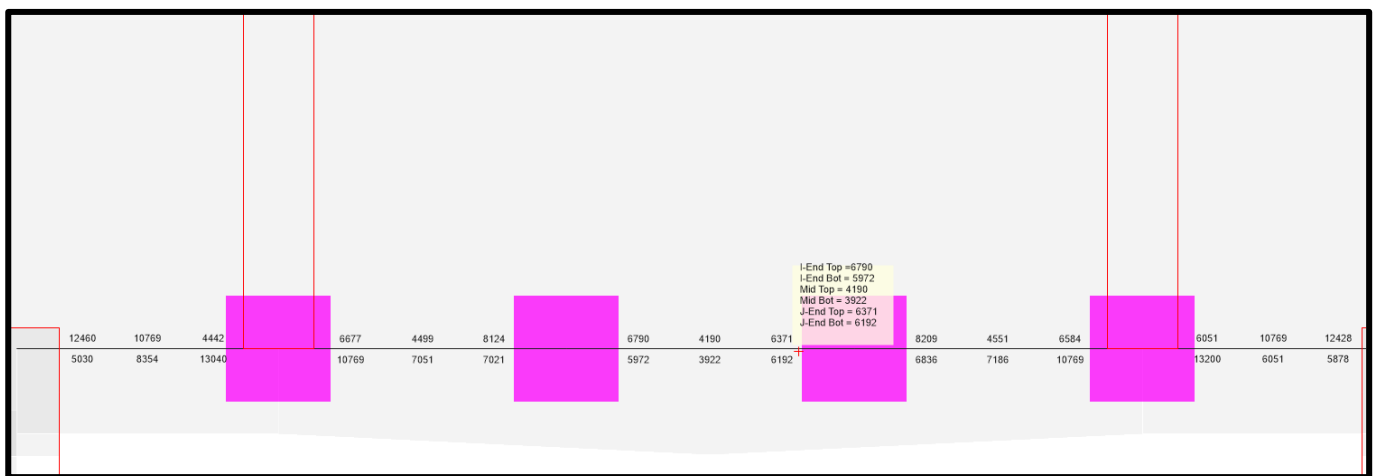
Edge Beam Flexural Longitudinal Reinforcement
